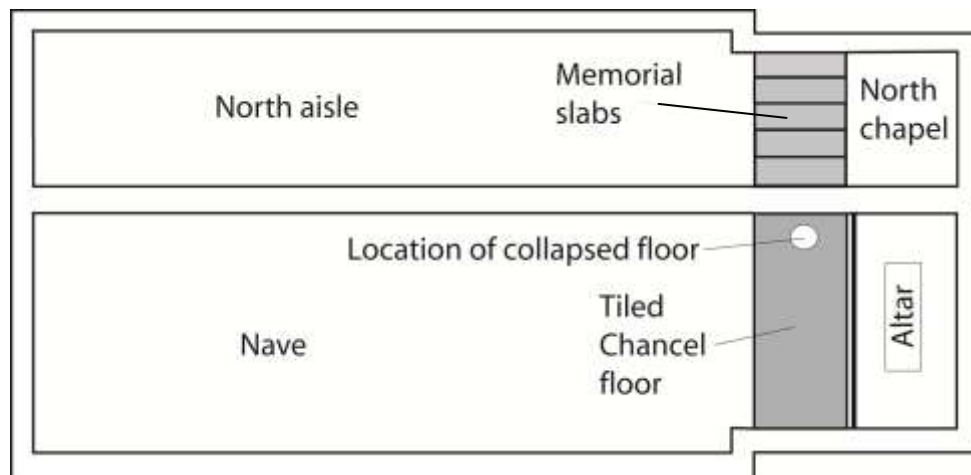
Schematic plan of the church indicating location of the collapsed floor of the chancel (not in proportion, not to scale, not all elements represented)
